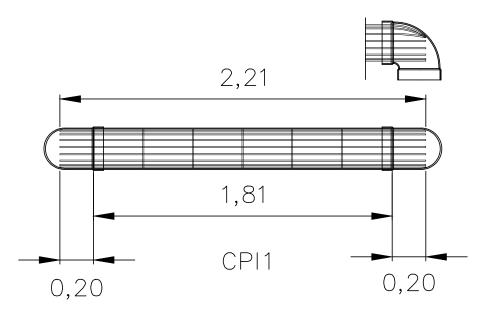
Dimensions of reinforcing cylinders and tubes for some elements: end crosspieces, deck, and inferior crosspieces (CPI) of section 1-1.
